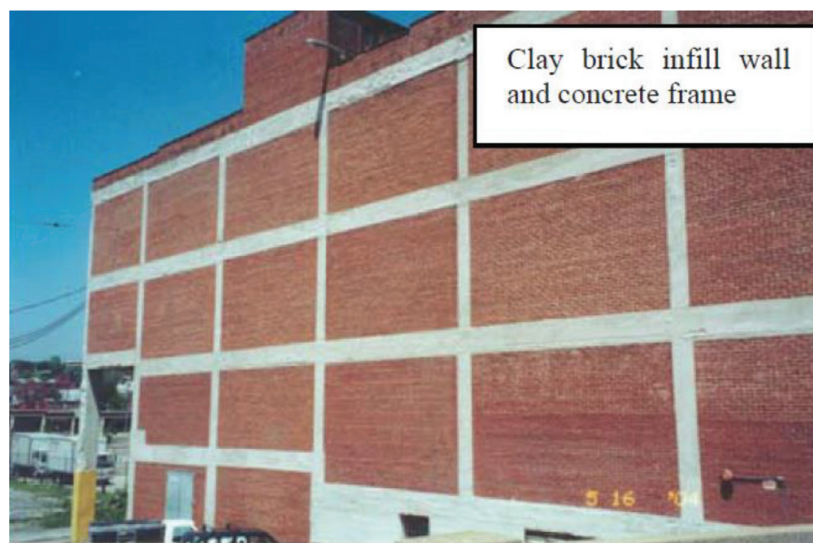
Examples of masonry infill wall in a reinforced concrete frame building [Photo by Ali M. Memari].
